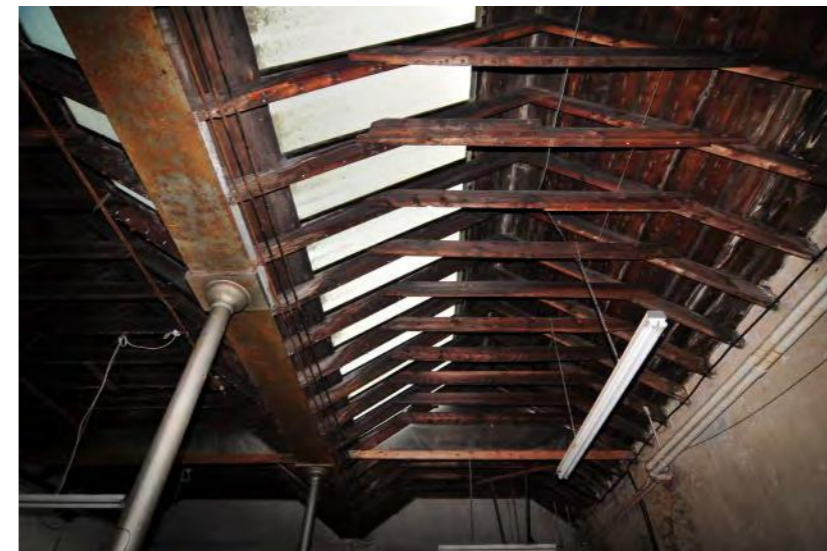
Building 4, Unit 41 exposed A-frame roof trusses and roof lights
